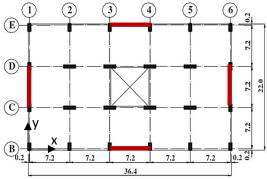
Plan of the structure showing the locations of shear walls [16] (all dimensions in m)
